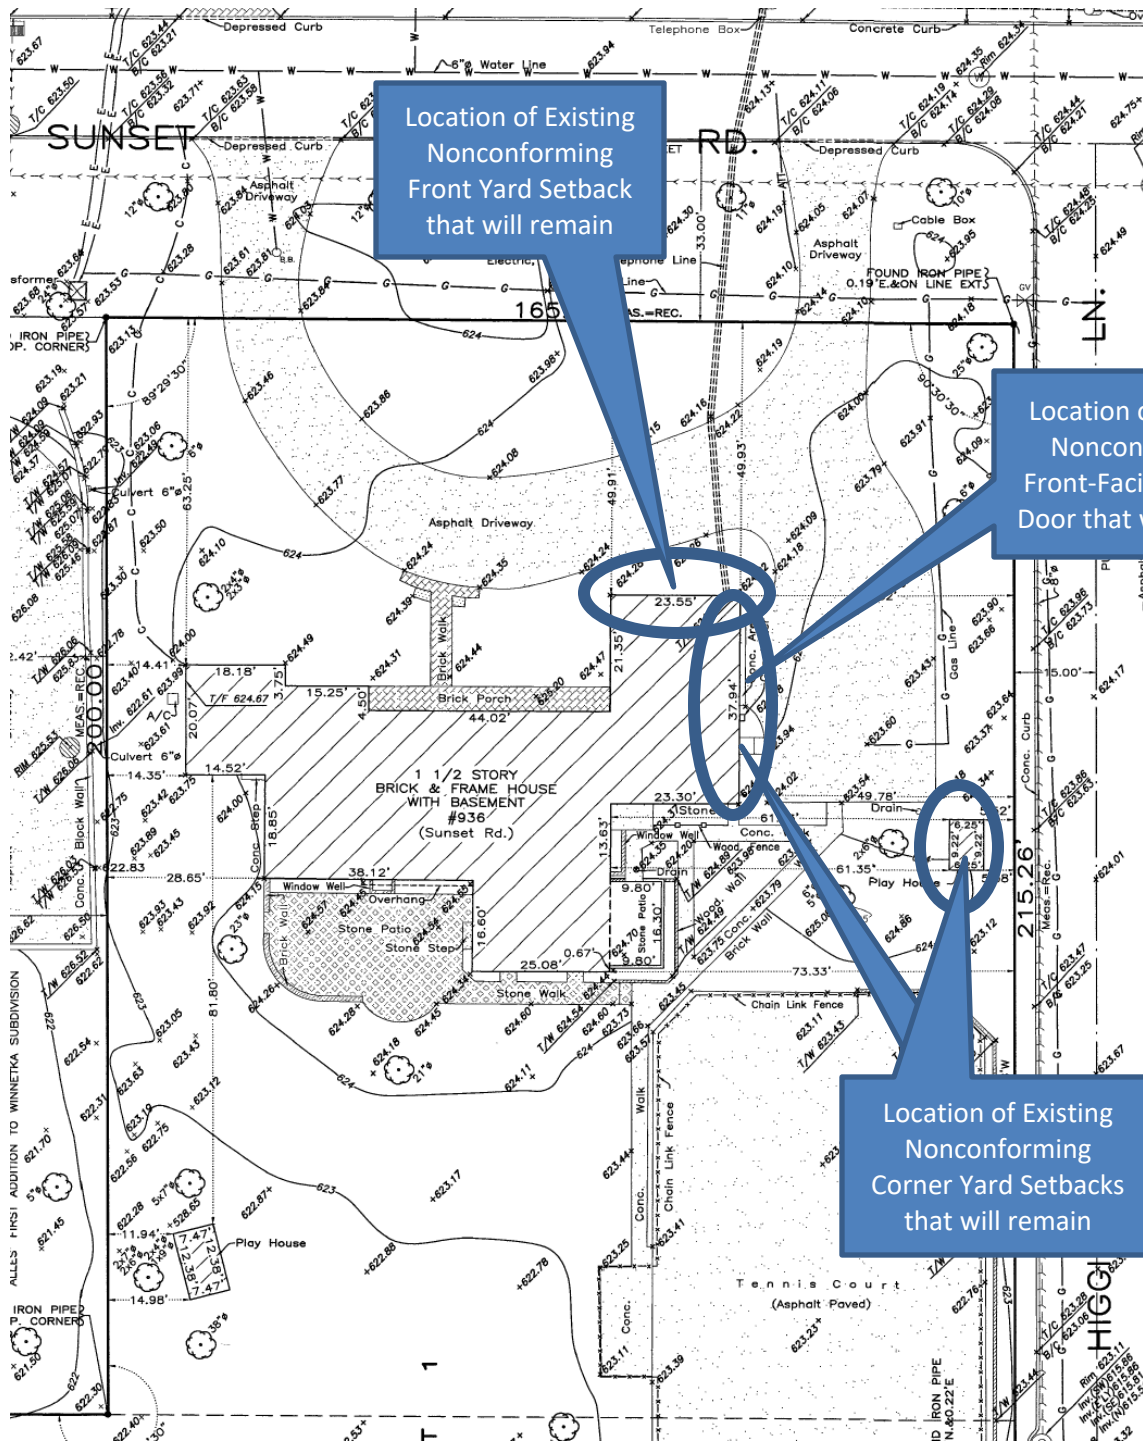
Excerpt of 936 Sunset Road Plat of Survey
